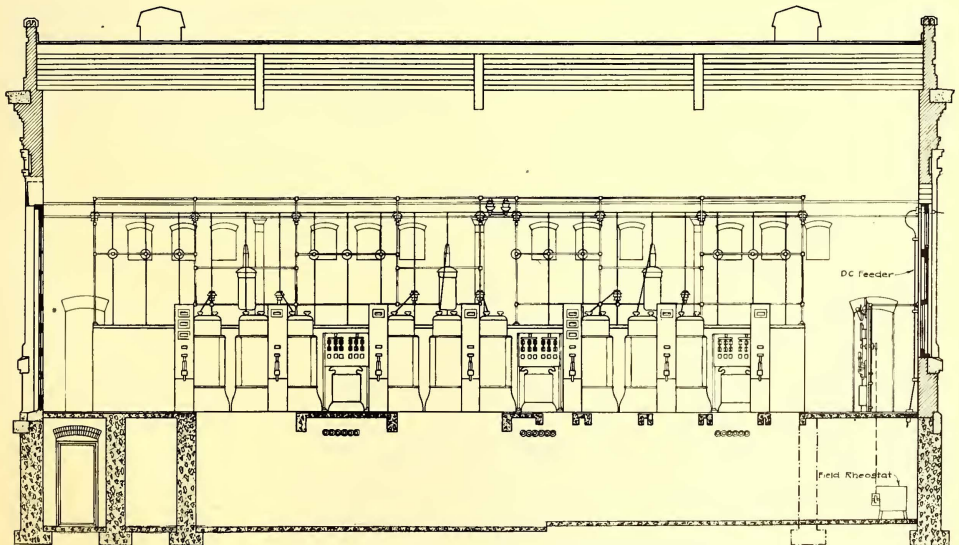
LONGITUDINAL SECTION OF TYPICAL SUB-STATION
